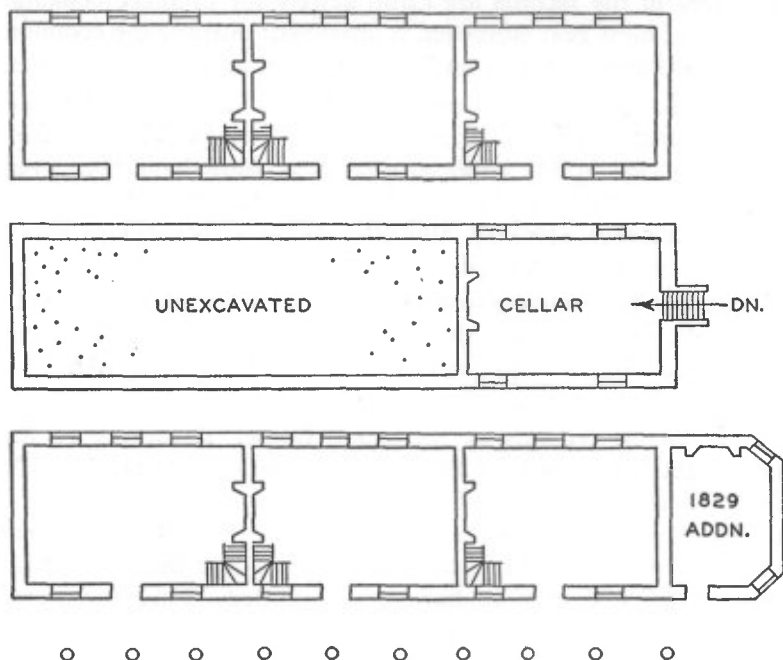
Building D, soldiers' barrack. The first two illustrations, from the top, show the main and cellar floor plans in 1814. The third is the floor plan of 1834 showing an additional room and porticoes.
